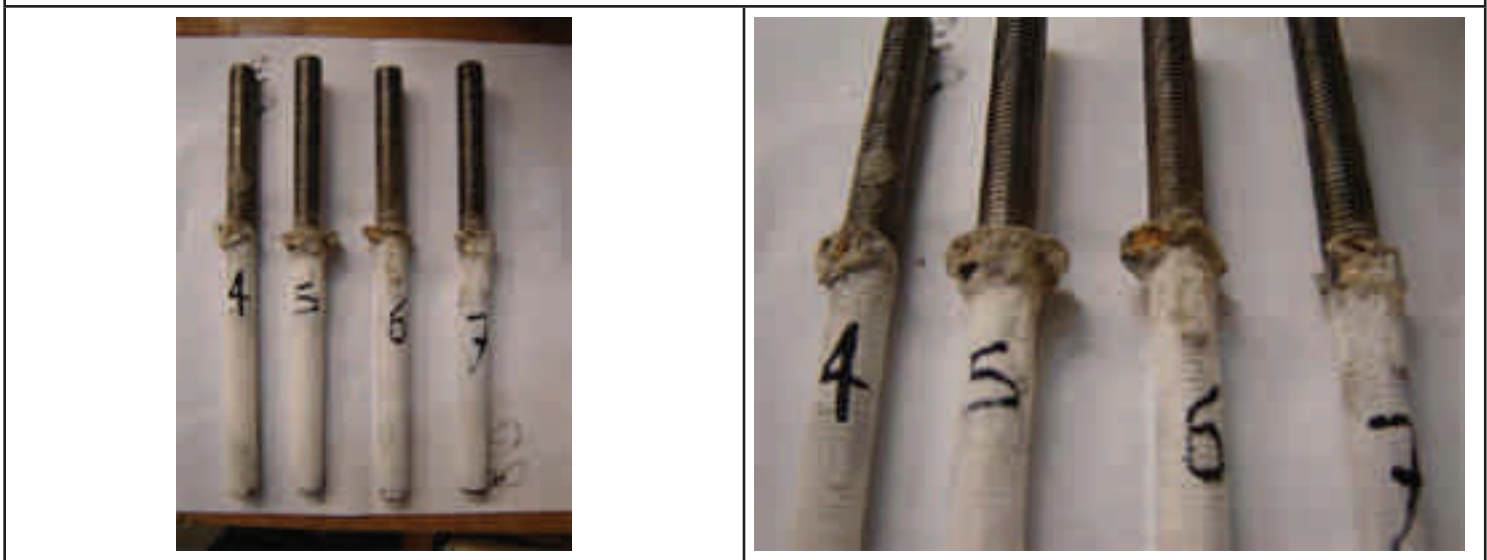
Pull-out failure of Test No. EF12-A1 after tensile loading in dry cleaned holes
